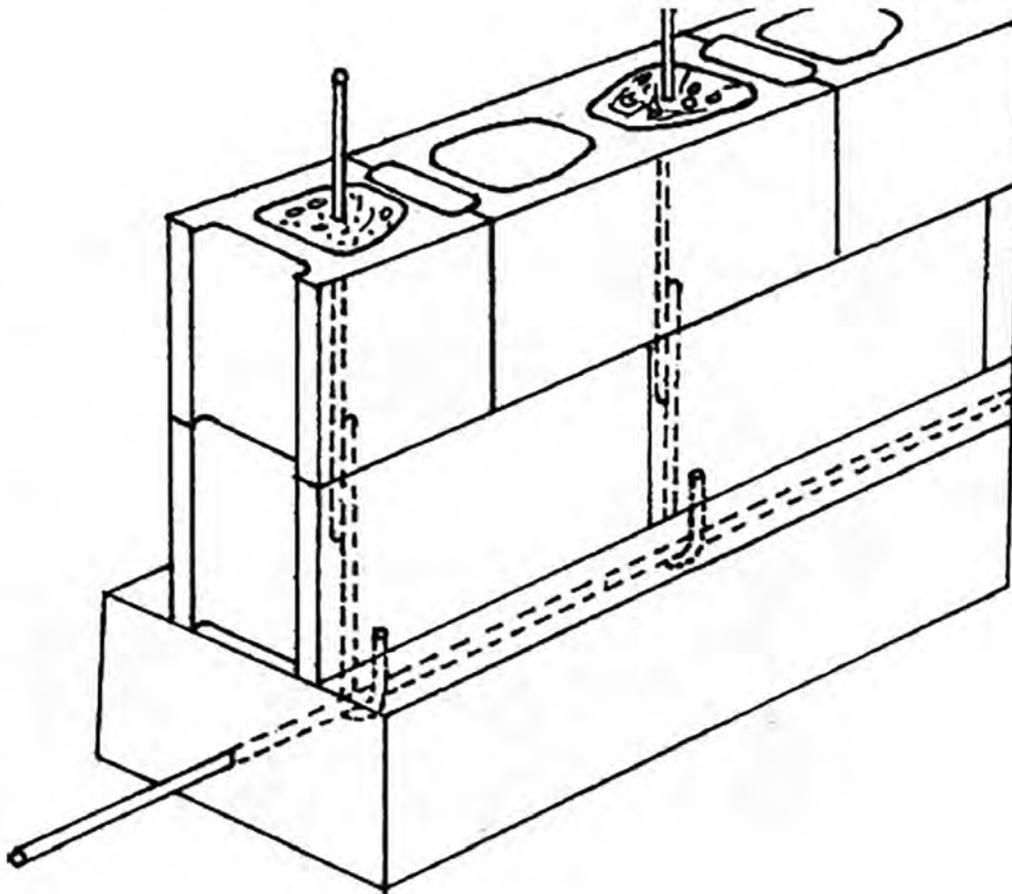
ANCHOR STARTER BARS INTO FOOTING. PROVIDE ADEQUATE LAP LENGTH FOR REINFORCEMENT. GROUT AROUND BARS FULLY
